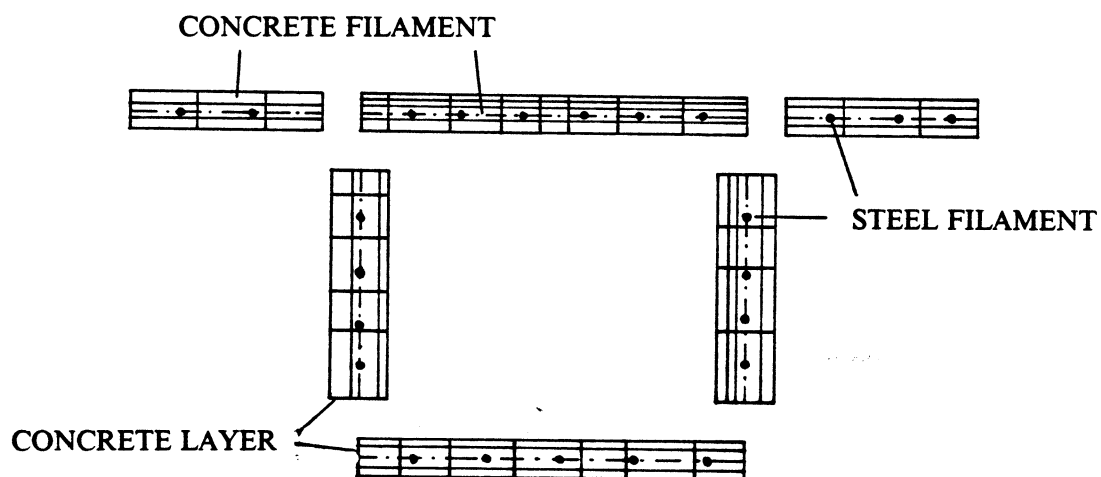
BOX CROSS SECTION IDEALIZED AS CONCRETE AND LONGITUDINAL REINFORCING STEEL FILAMENTS
